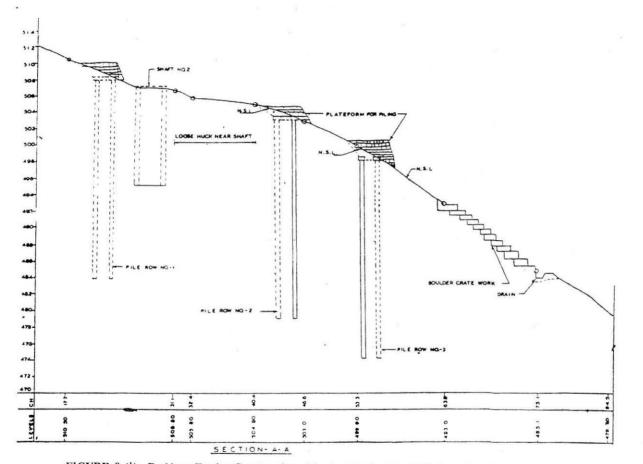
(b) Problems During Construction of Anchor Blocks 11 and 12, L-section (Loktak H.E. Project)
